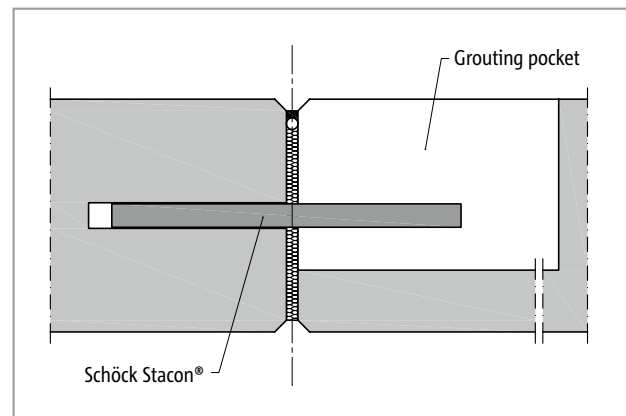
Schöck Stacon®: Expansion joint formation precast concrete balcony
